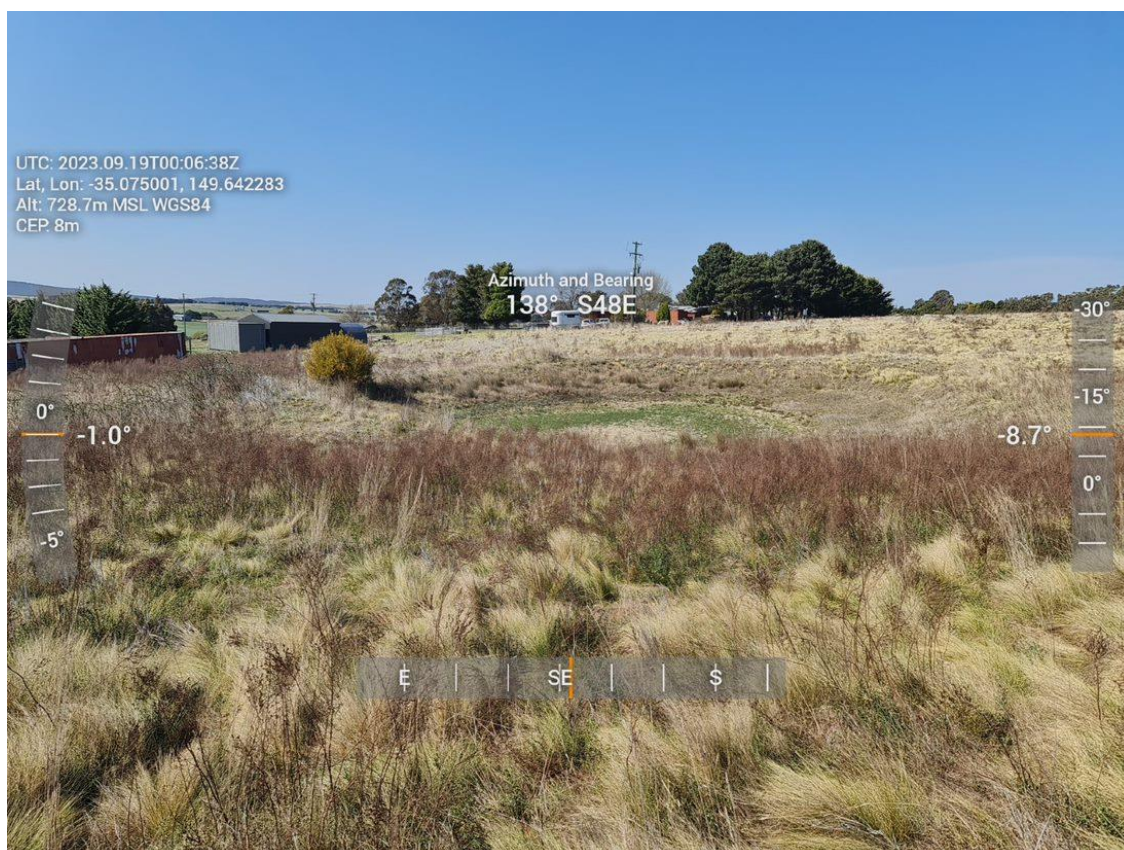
Looking southeast over proposed Lot 5 and dam to be redeveloped to become a bioretention basin.
